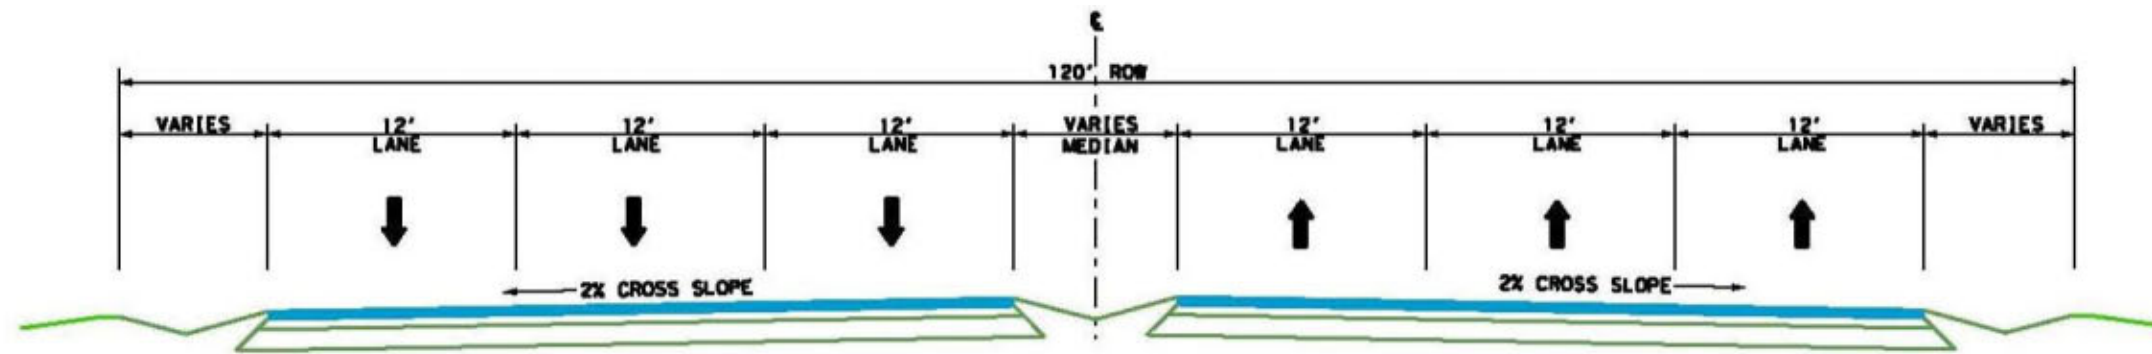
Typical Section – P6D and M6D Six Lanes Divided with Median
